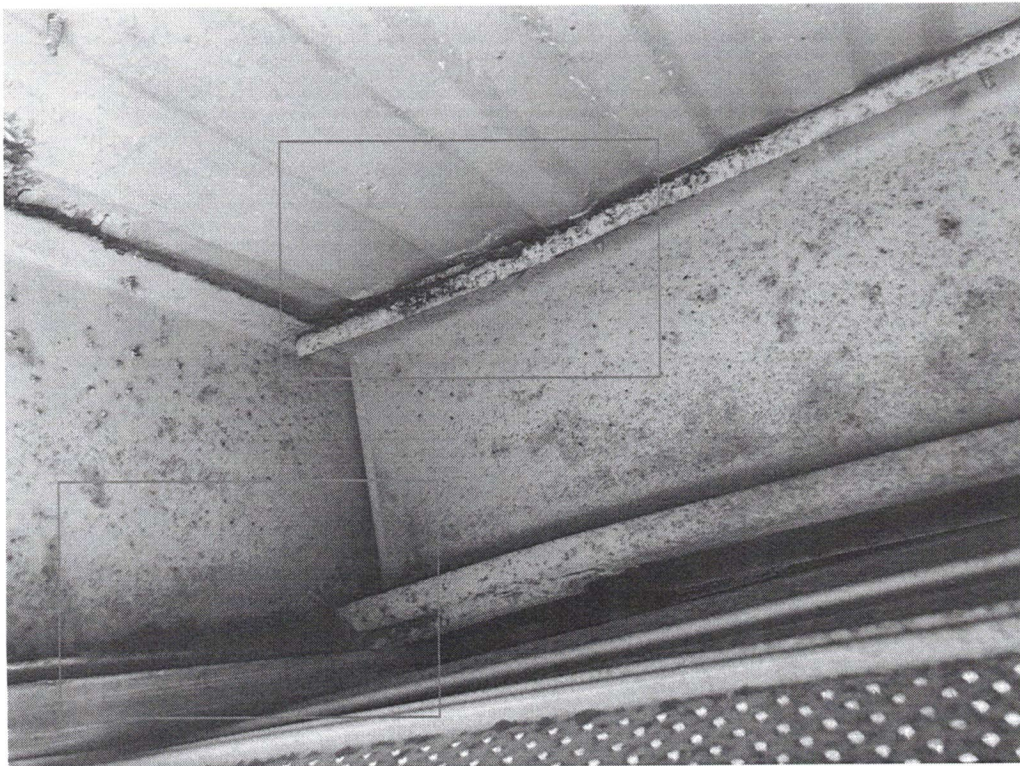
Deteriorated C-Joist and Rim Joist to be Replaced
